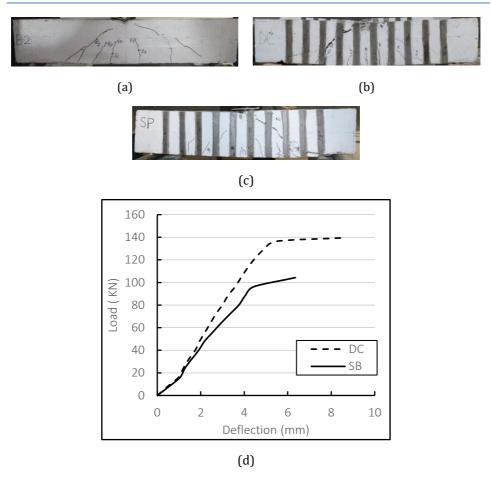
(a) Damaged beam for DC, (b) Failure mode of beam DC, (c) Failure mode of beam SB, (d) Deflections of beams DC and SB
